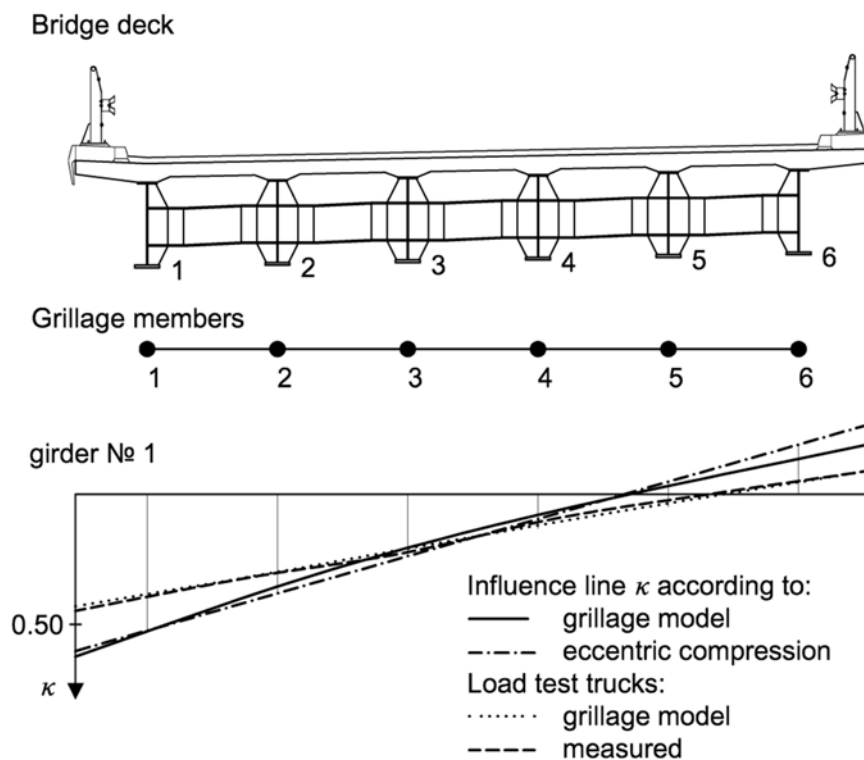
Cross section and live load distribution for an external girder in a six-girder composite bridge
